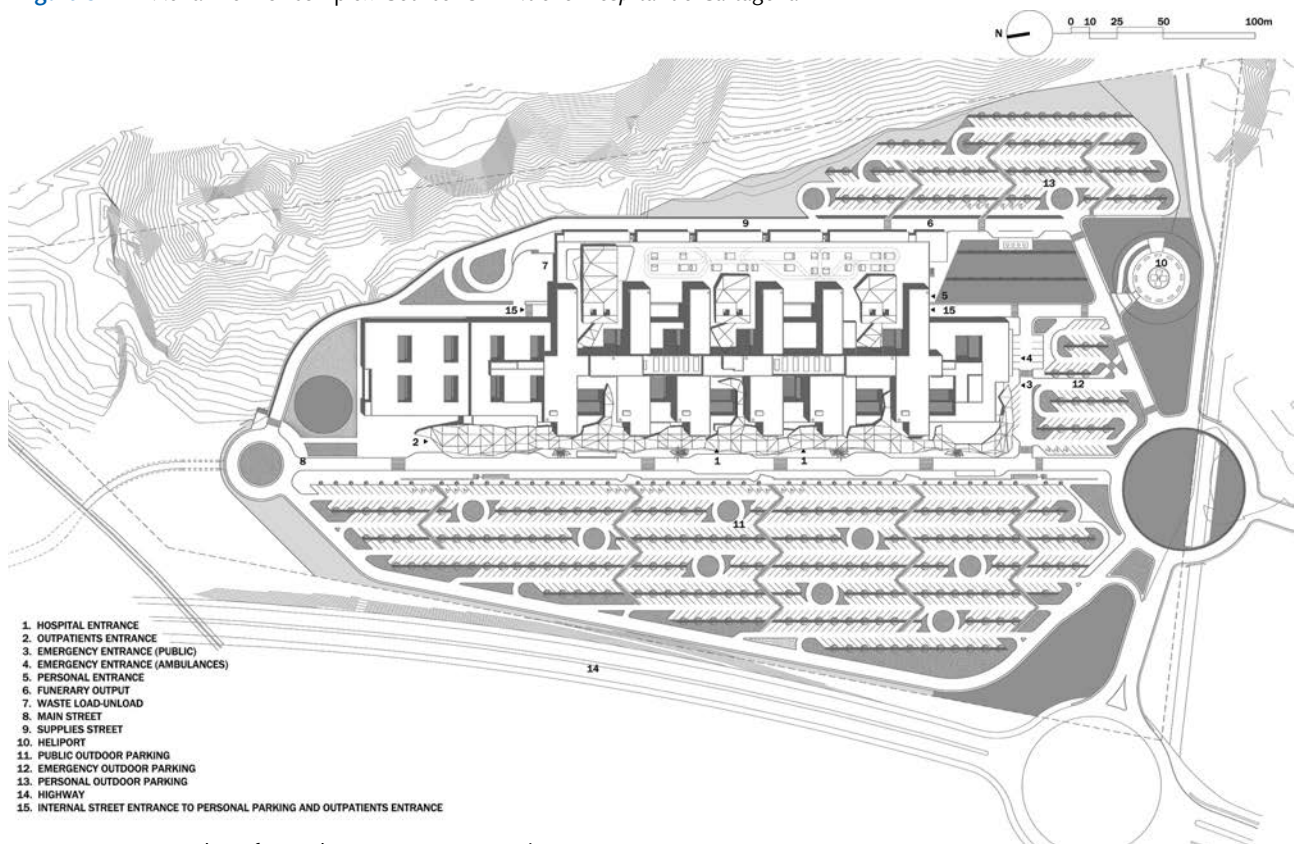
Site plan of complex. Source: CASA Solo Arquitectos SLP
